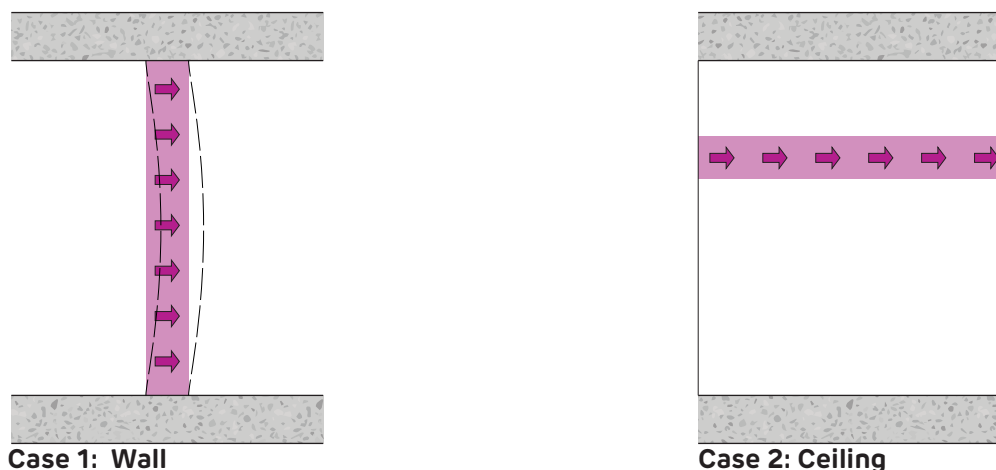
Typical Seismic Actions for Lightweight Walls and Ceilings
